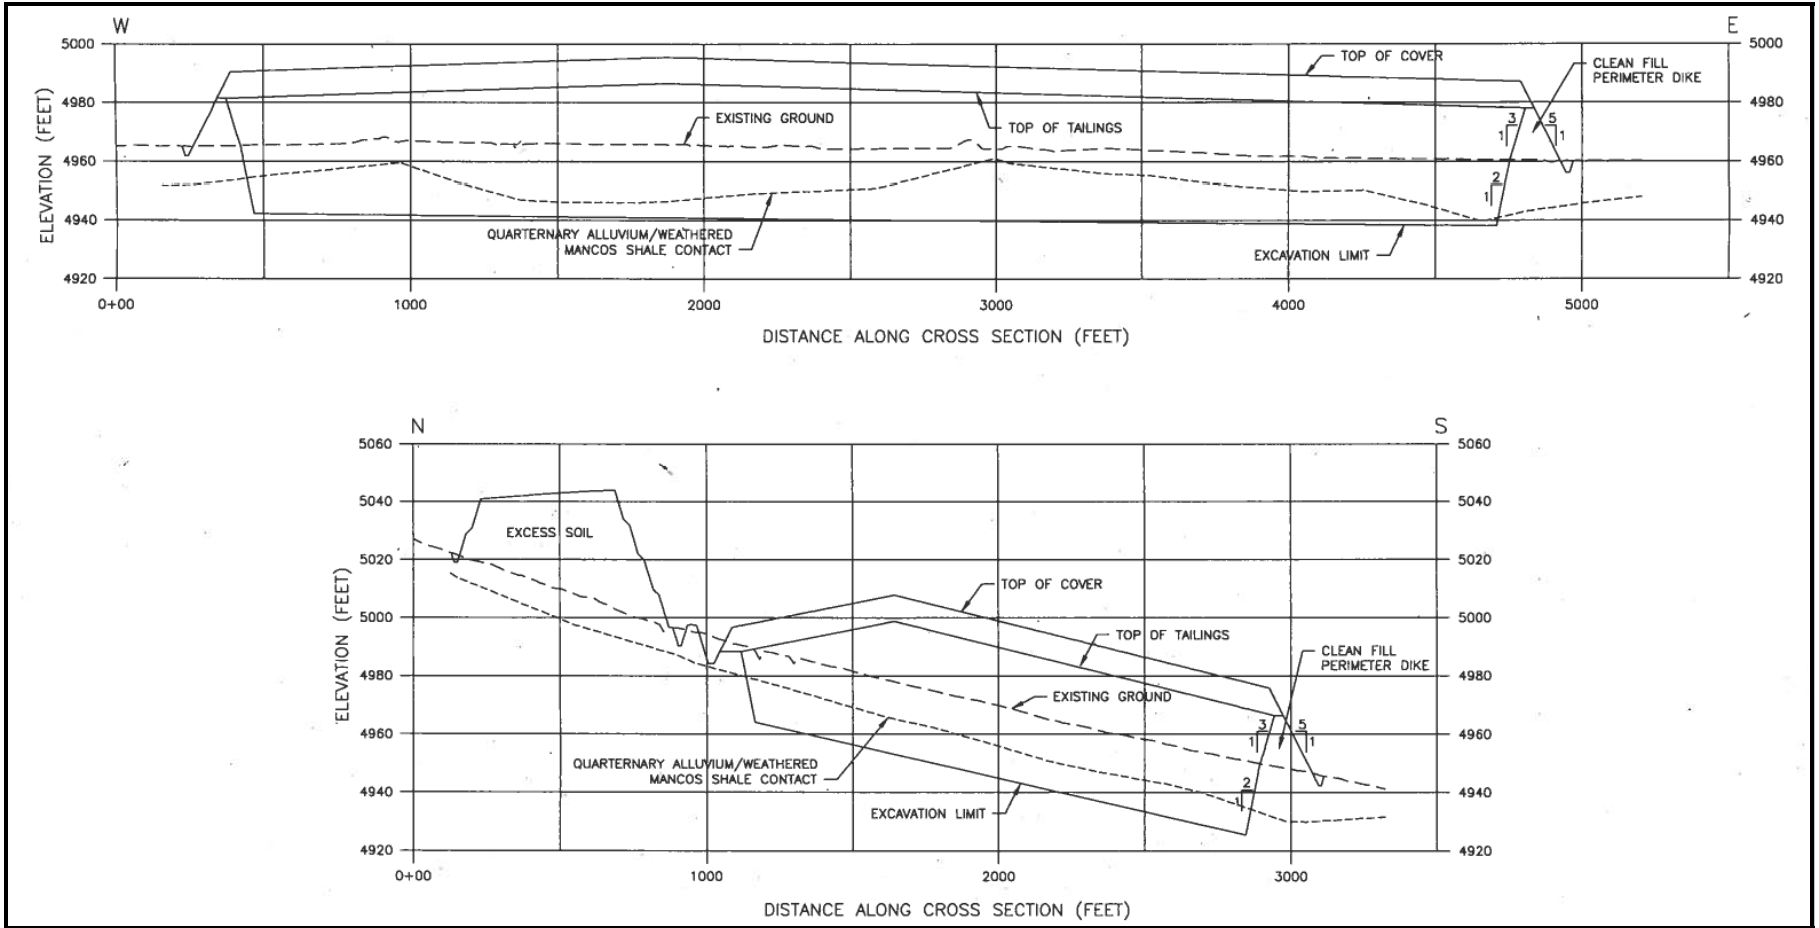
Typical Cross Sections for Crescent Junction Disposal Cell
